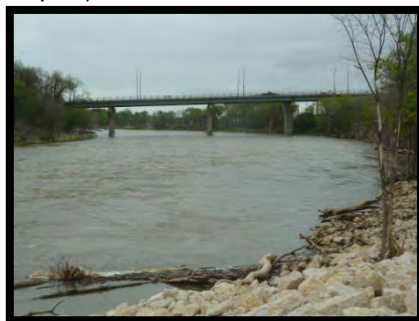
Looking (east) at the west elevation, May 29, 2013 (Inspection Report).
